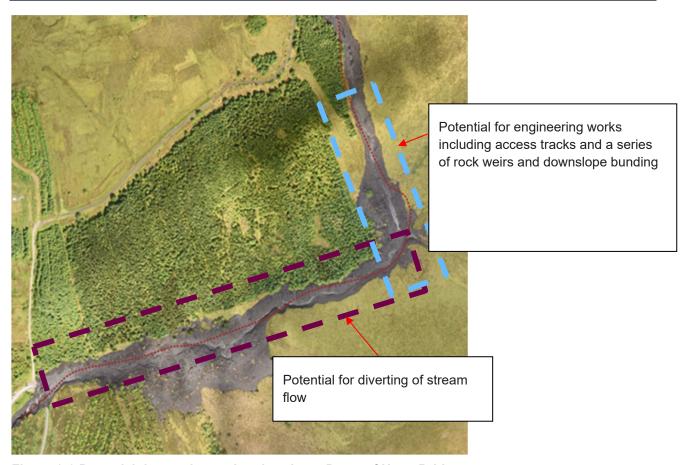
Potential dewatering and rock weirs at Dawn of Hope Bridge
